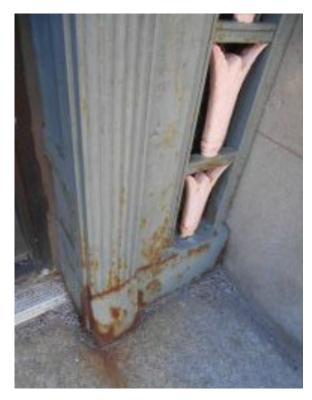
North elevation contemporary detail of west door showing corroded metal substrate condition.
